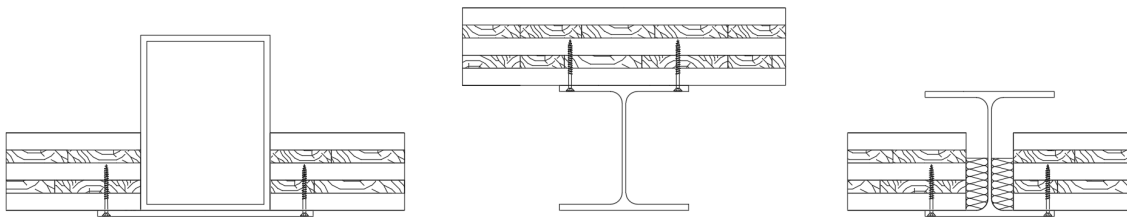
Cross-sectional examples of CLT-steel structure assemblies
